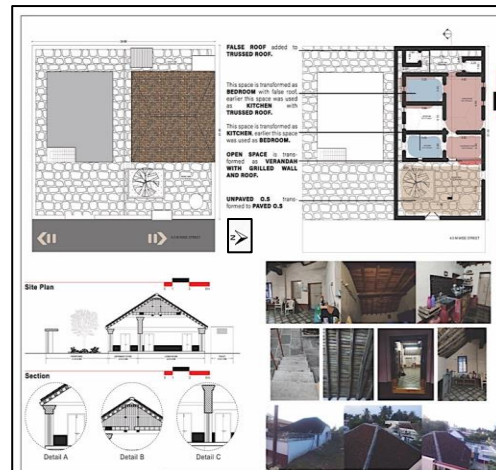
Plan, Site Plan, Section and transformation of House no. 20,
